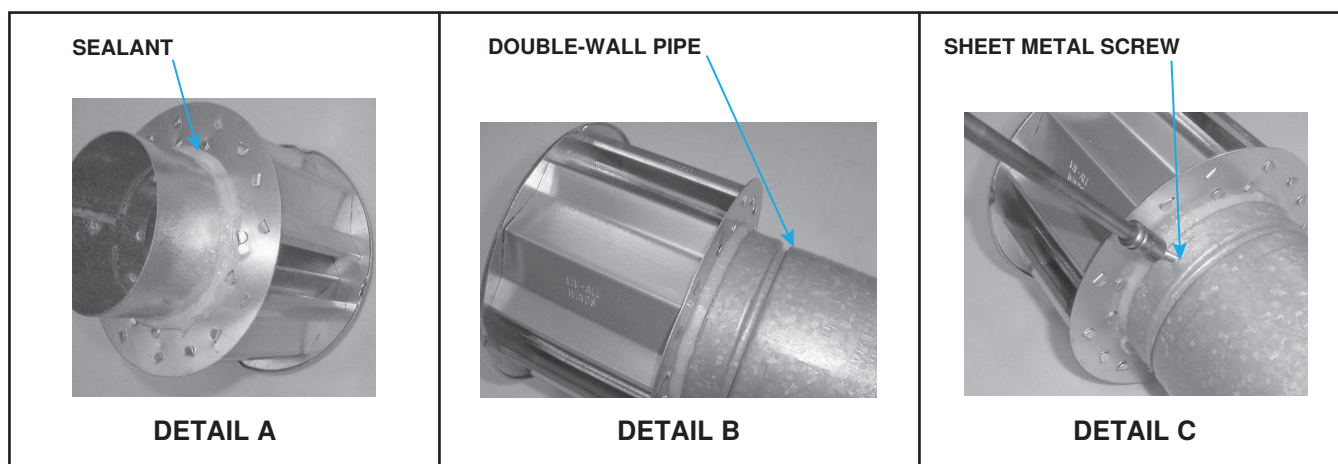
Connecting Double-Wall (Type B) Pipe to Vent Cap
